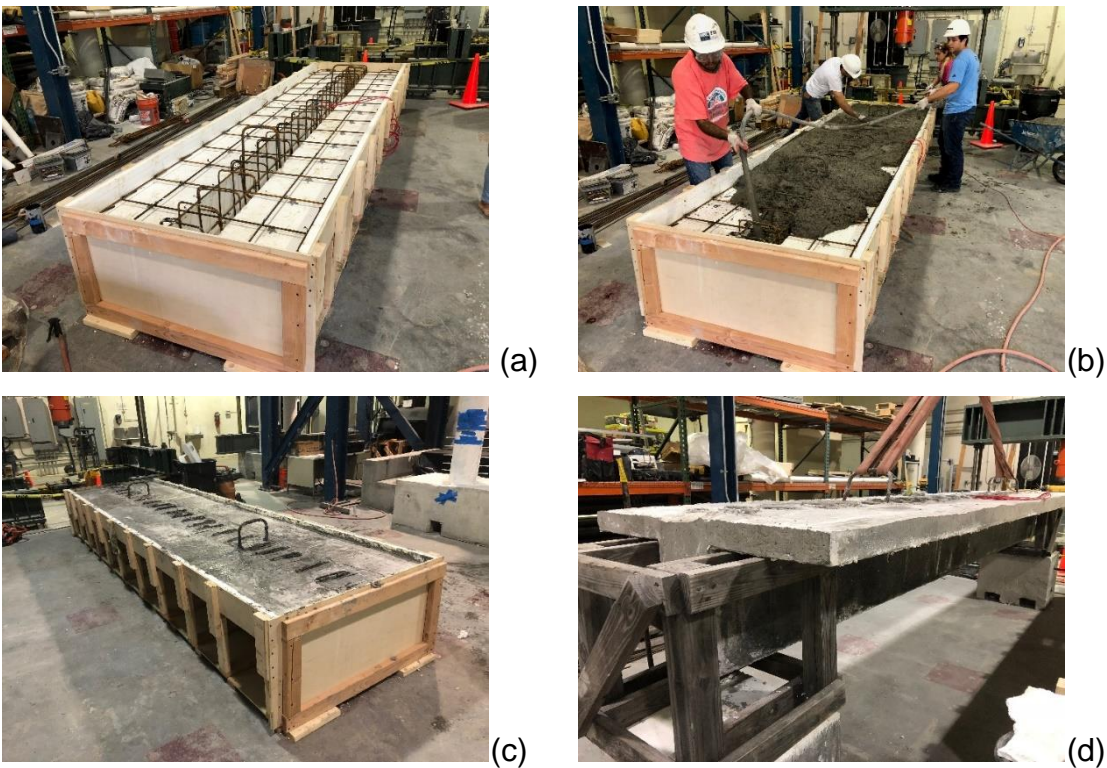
T-Beam test specimen: (a) Formwork of the initial damaged section; (b) Casting conventional concrete in the formwork; (c) Test specimen after casting; (d) Test specimen after demolding.
